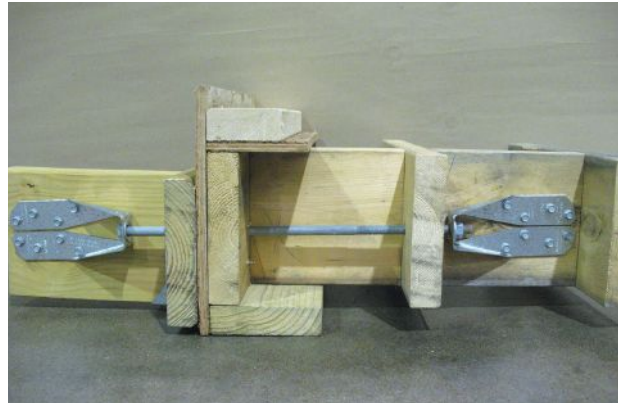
When there's a finished ceiling, cut a hole to match the size of the planned access panel and bore the rod hole through the ledger and rim joist from the outside. A right-angle drill/driver may be needed to screw the anchor to the side of the joist.
